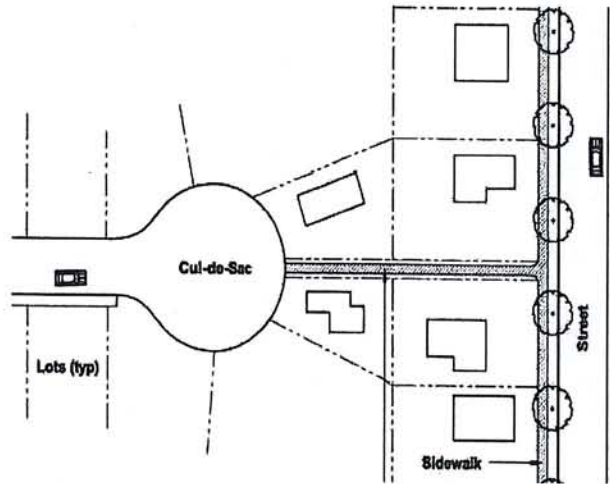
A: 10 ft. access easement from head of cul-de-sac to nearest street or path
